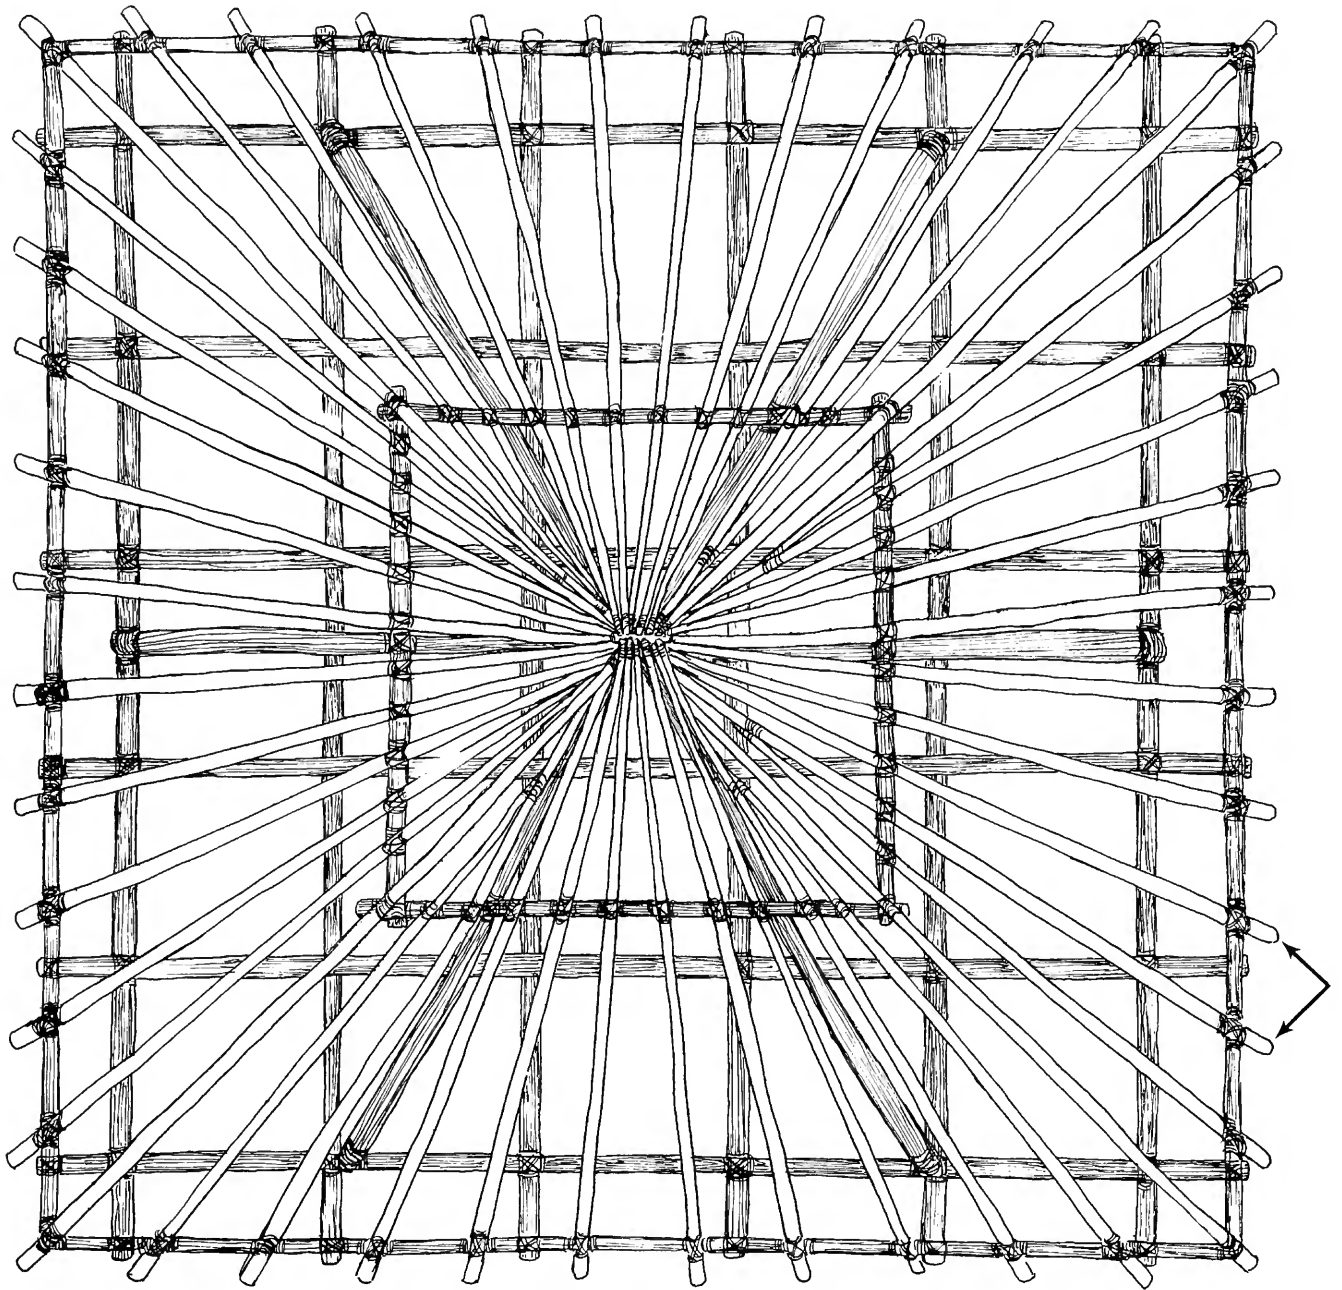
Roof plan with rafters in place: arrows point to rafter, sak-te'.
